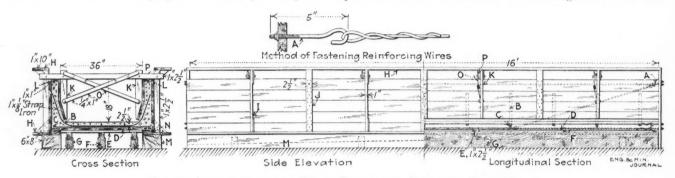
ARRANGEMENT OF WOOD FORMS FOR CONCRETE LAUNDER
